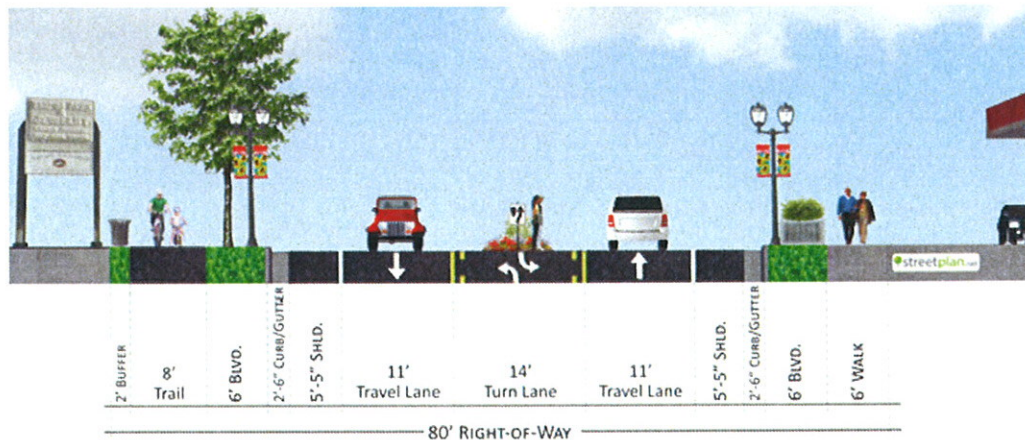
Illustrated potential typical section of Commerce Drive with a multi-use path, pedestrian refuge, and streetscaping amenities.
